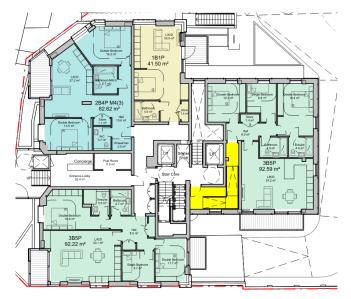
Ground Floor Corridor to be Ventilated by AOV
